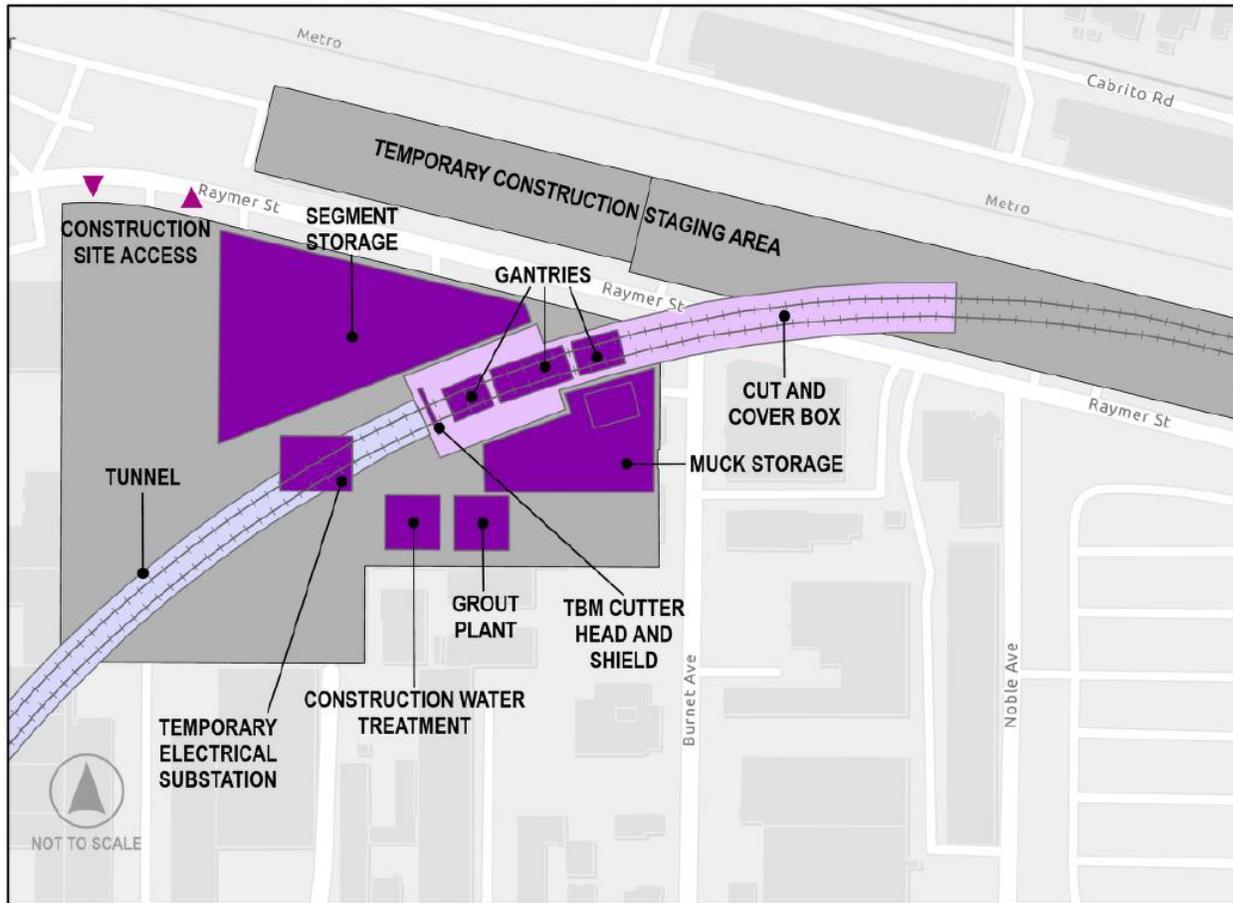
Alternative 5: TBM Launch and Extraction Site
